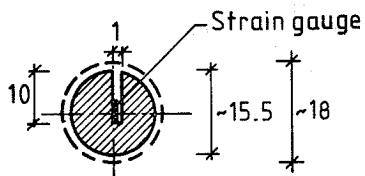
Gross section of the groove cut in the longitudinal tensile reinforcing bar.
